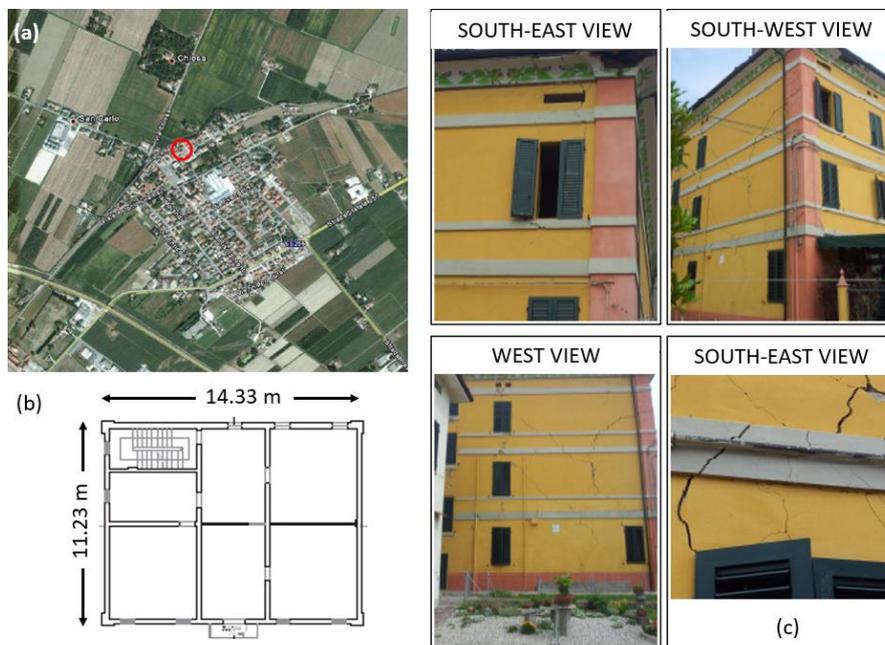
Location of the site (a), plan view of the selected shallow-founded building (b) and observed damage pattern (c).
